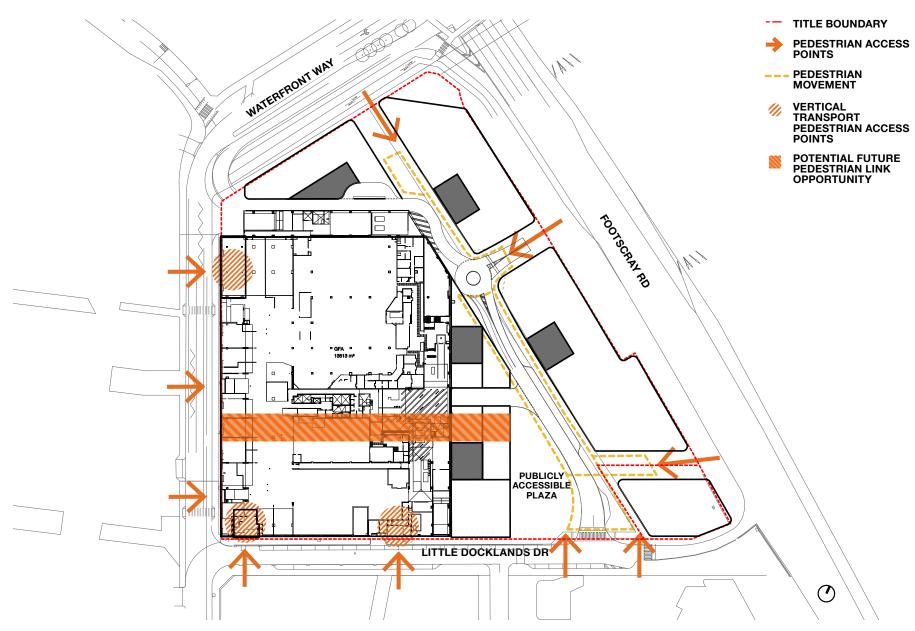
Movement and Parking Plan 1 - Ground Floor pedestrian paths and access points
